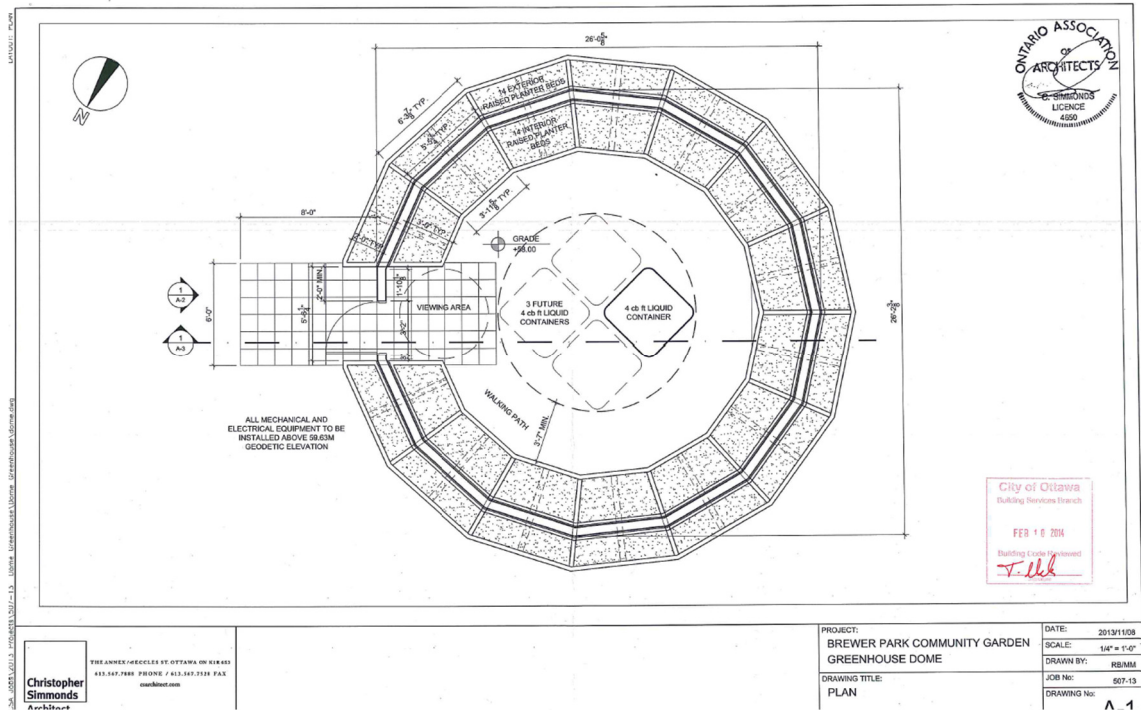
Architectural drawing of proposed Biodome layout (Christopher Simmonds Architect Inc., 2014). Adapted with permission.
